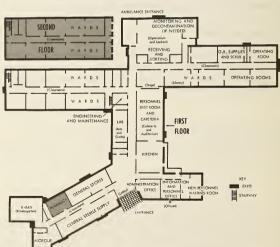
Sample Floorplans for Setting Up the PDH in a School Building
